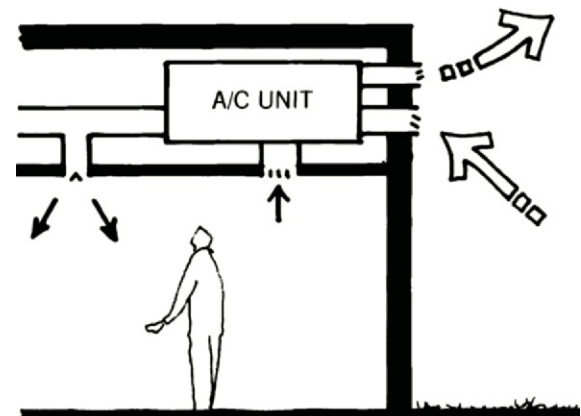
A packaged unit designed for placement above a suspended ceiling or in an attic is shown.
